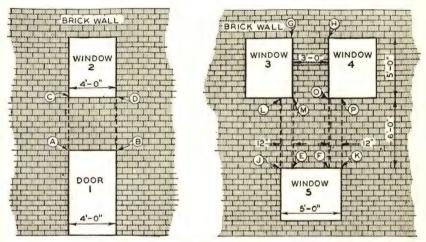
Various Combinations of Window and Door Openings in a Brick Wall
